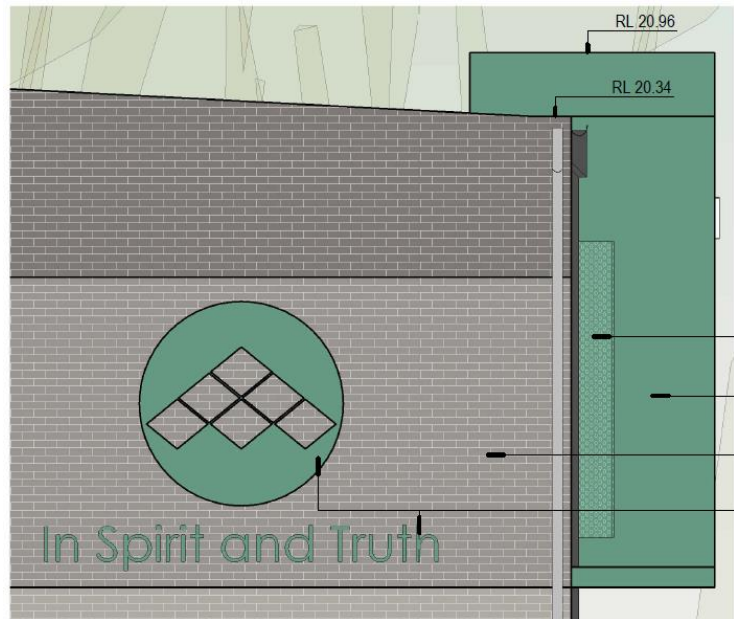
Proposed sign – south elevation (Source: Leaf Architecture)
